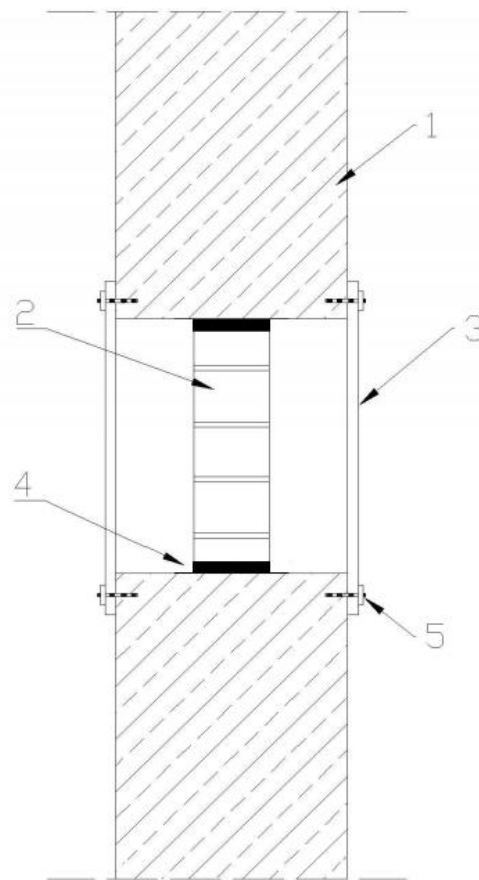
INTU FR GRILLE EI60 / INTU FR GRILLE EI120, $\varnothing 200$ mm
